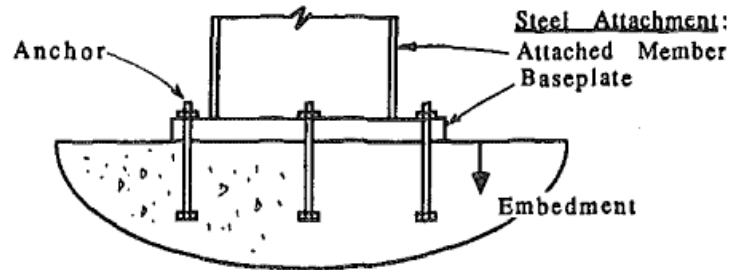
Example of multiple-anchor (Wald et al., 2008).
